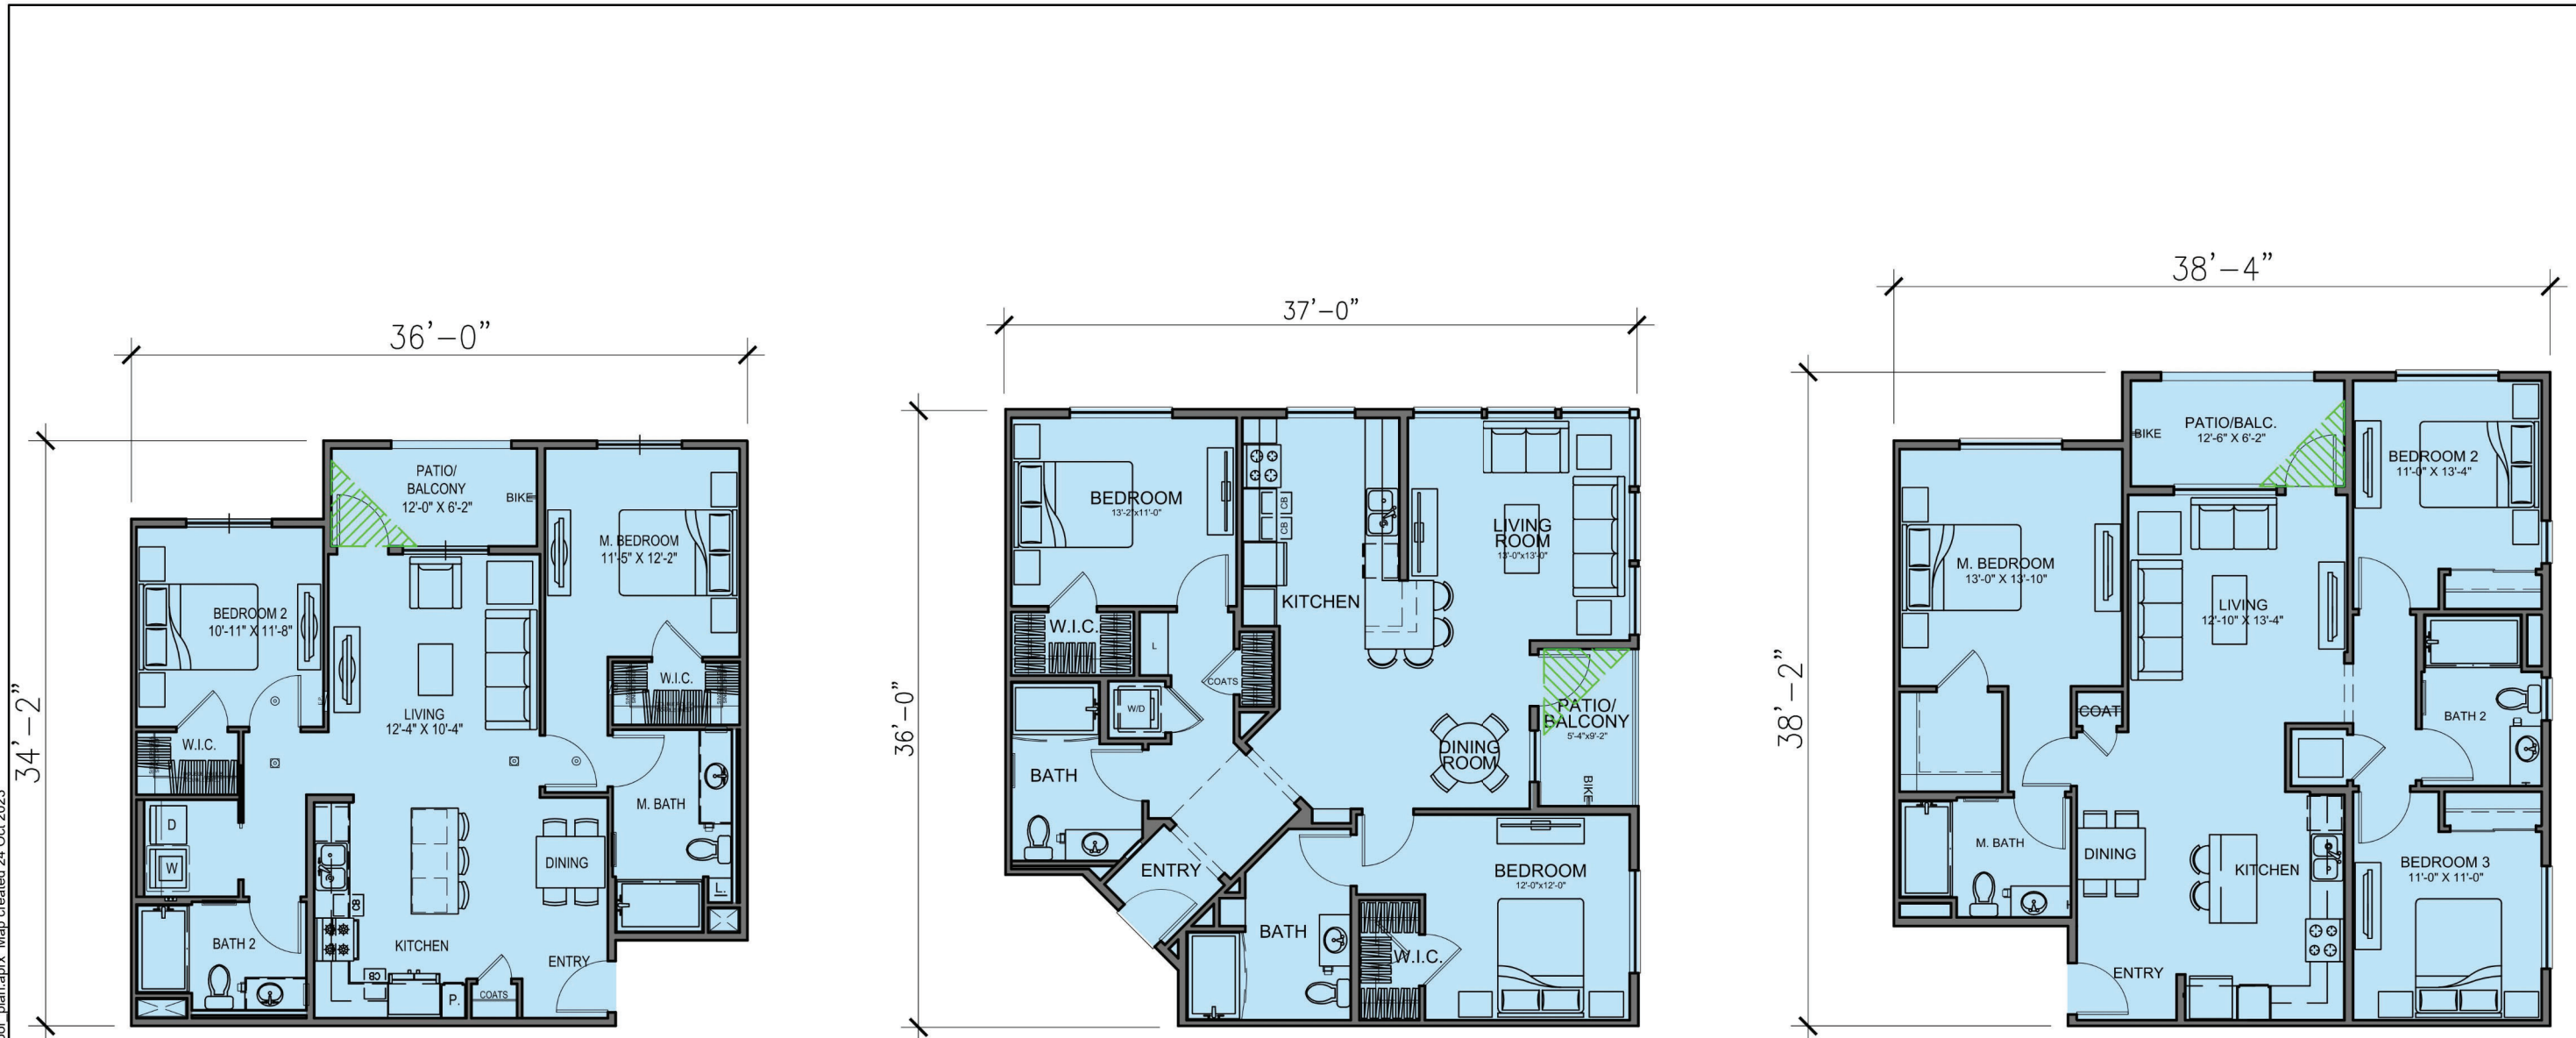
Proposed Floor Plans [Garden Style Plans 1 of 2]
